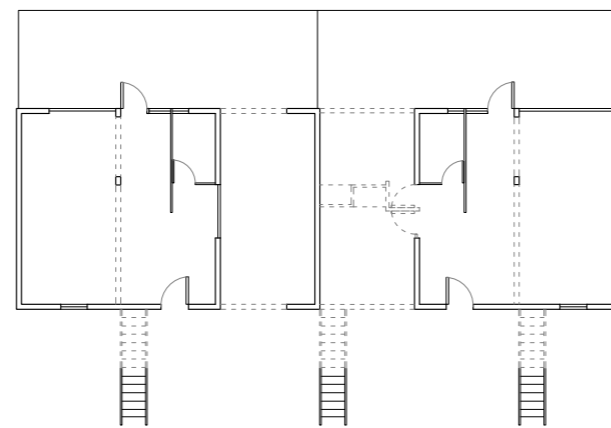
Housing unit floor plans of Quinta Monroy development
